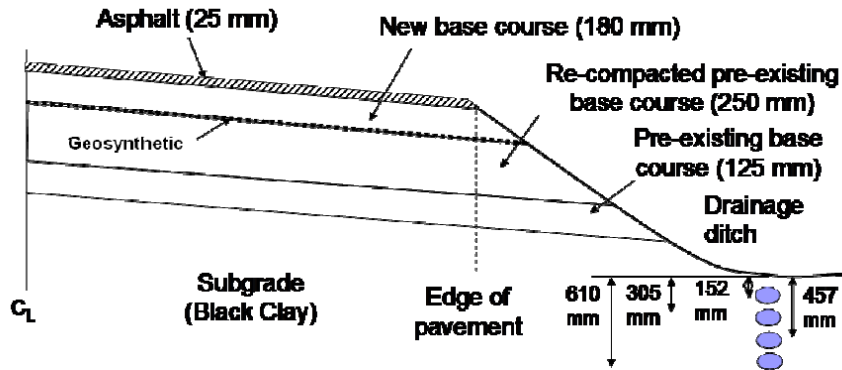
Placement of vertical moisture sensors at FM 2 site (Modified after Gupta (2009))
